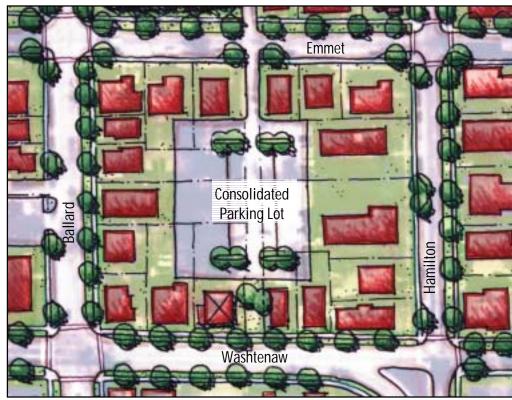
Consolidated parking lots would be paved, landscaped and lighted.
